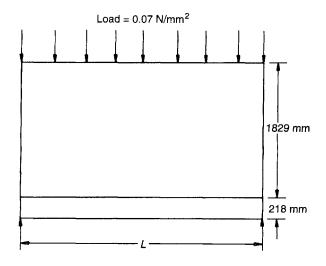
Dimensions for wall beam example. L=2743 mm, b=t=115 mm.
